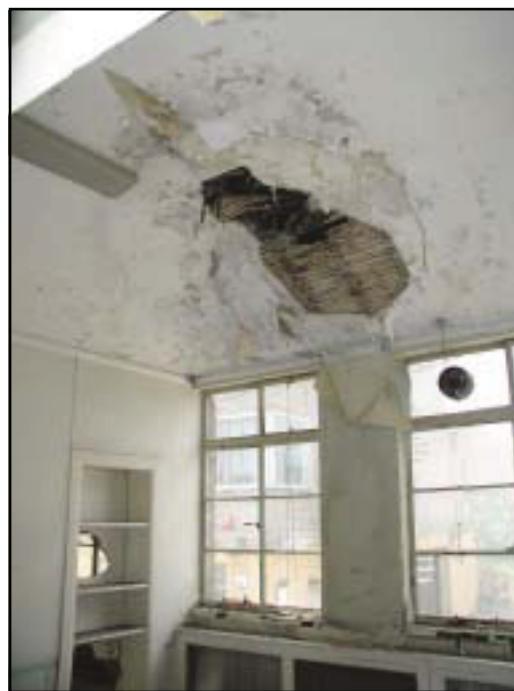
The Star Brush Works Office, Original Roof Lath and Plaster Ceiling
